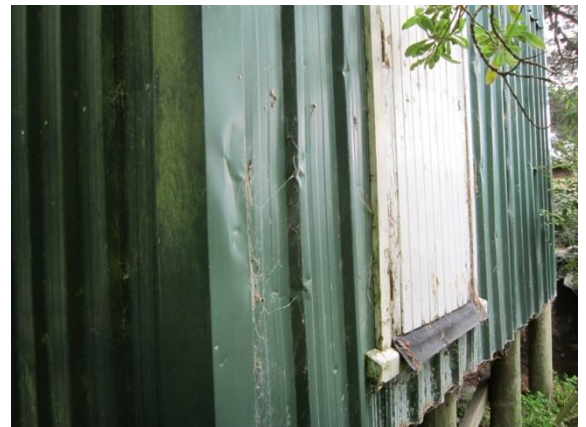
Suspected impact damage to corrugated external wall cladding
